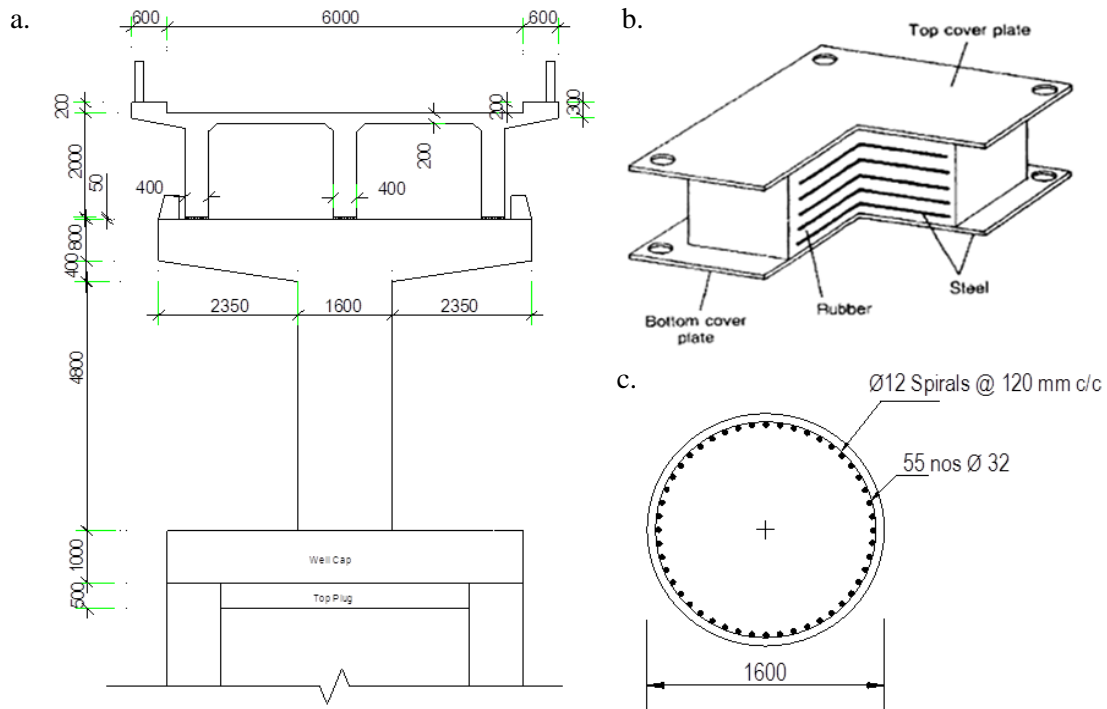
Bridge component details; (a) bridge section, (b) bearing detail, (c) Pier section (all dimension in mm)
